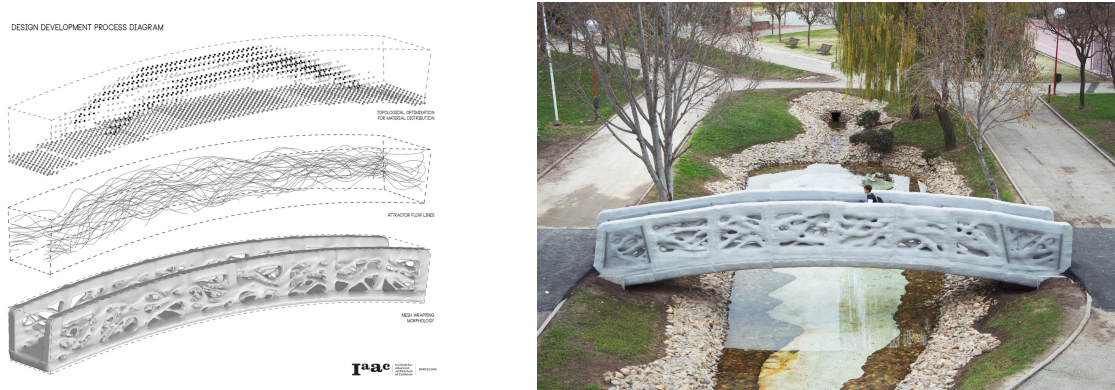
3D Printed Concrete Bridge (Jokić and Novikov 2017)
